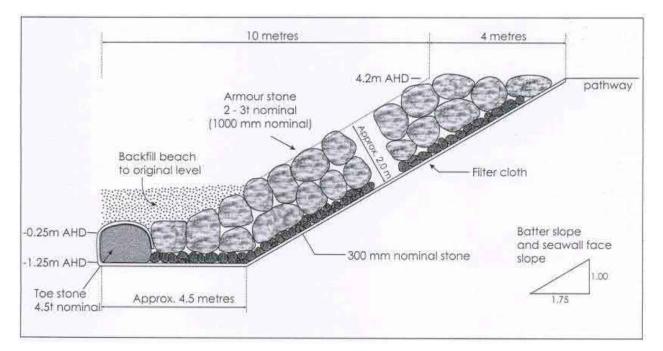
Standard Design for rock revetment seawall on the Metropolitan Adelaide Coast (CPB, 2011)
